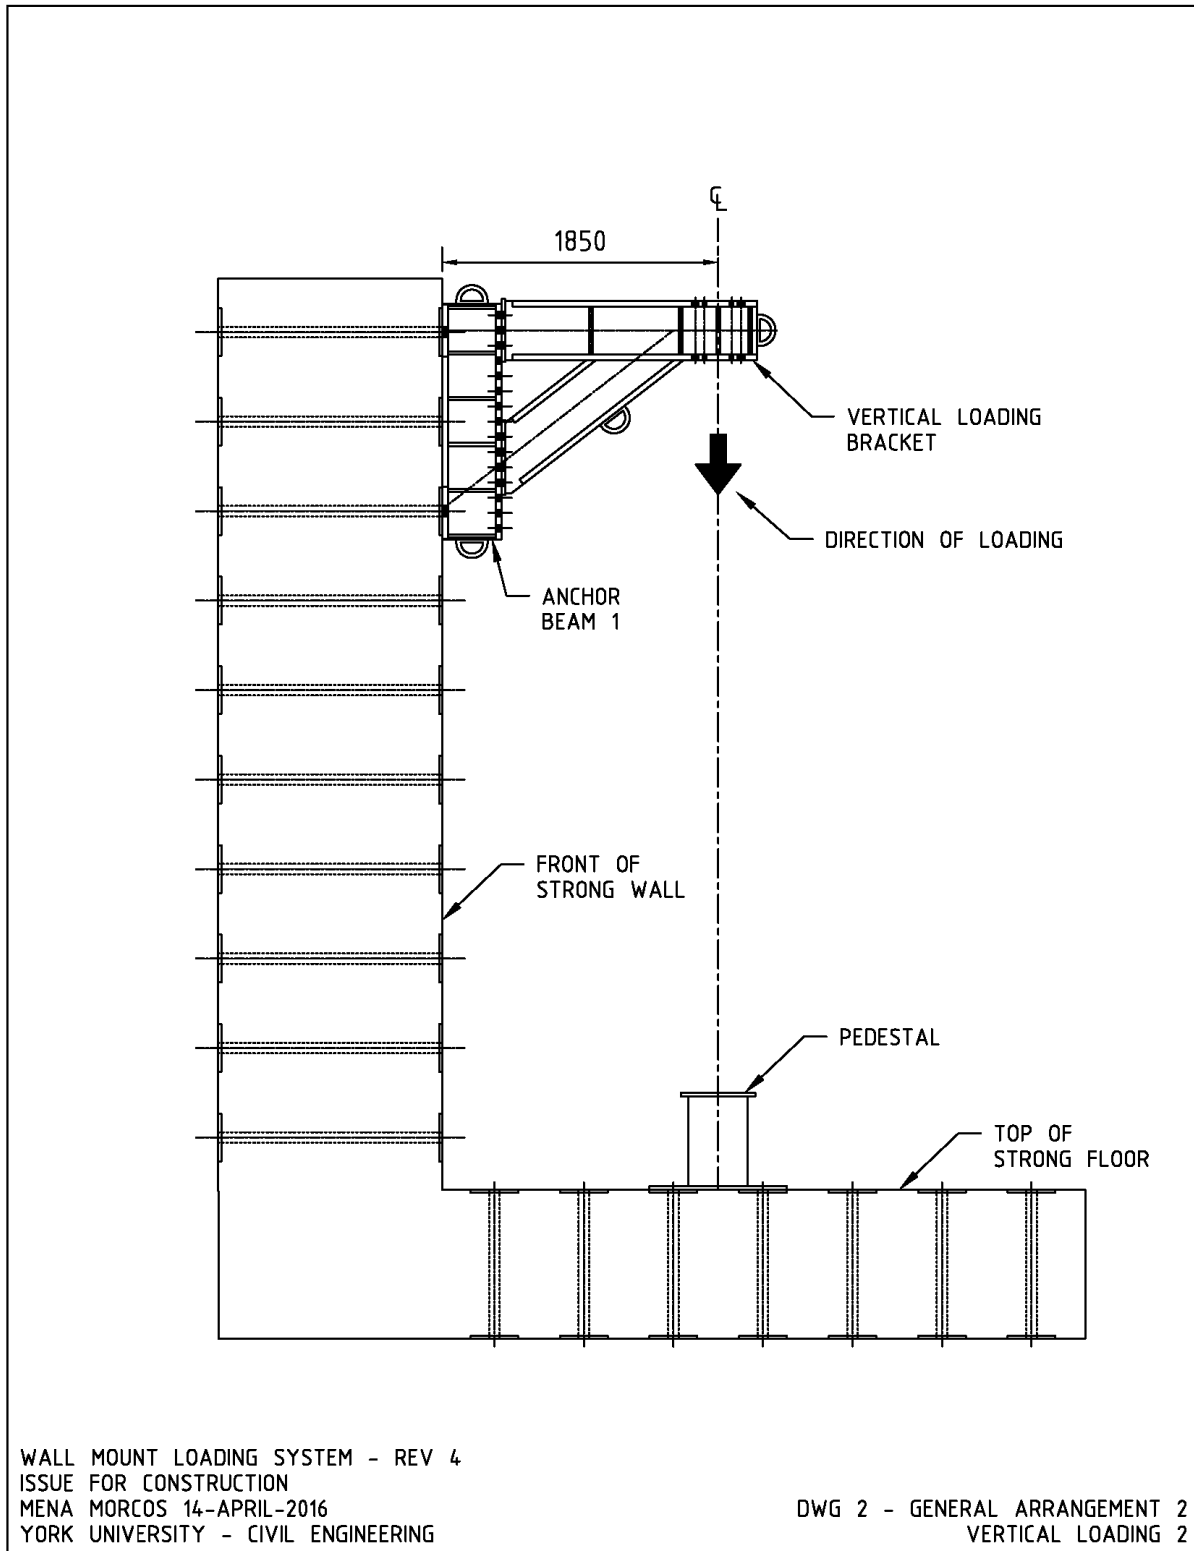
Wall mount loading system design and fabrication drawing – Drawing 2.
